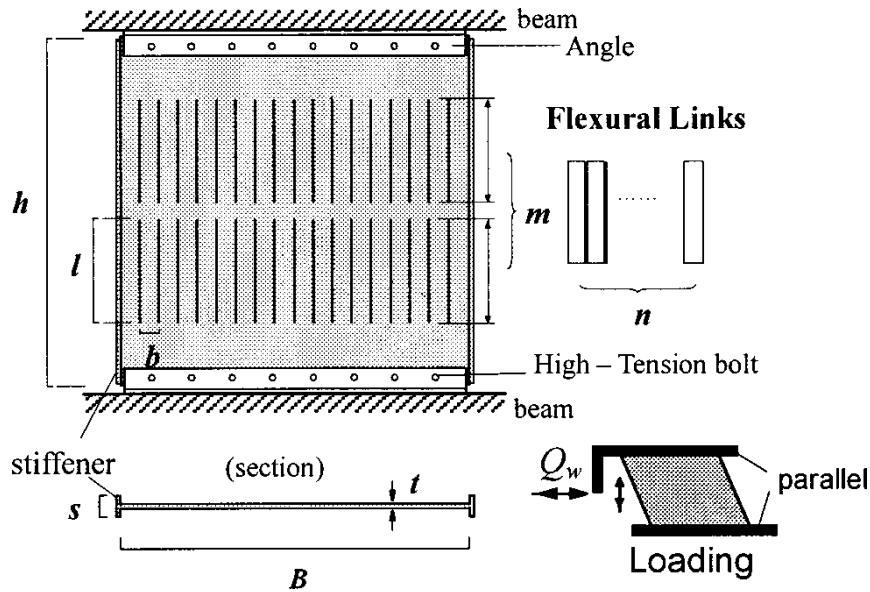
Schematic of steel shear wall with slits (from [13])
